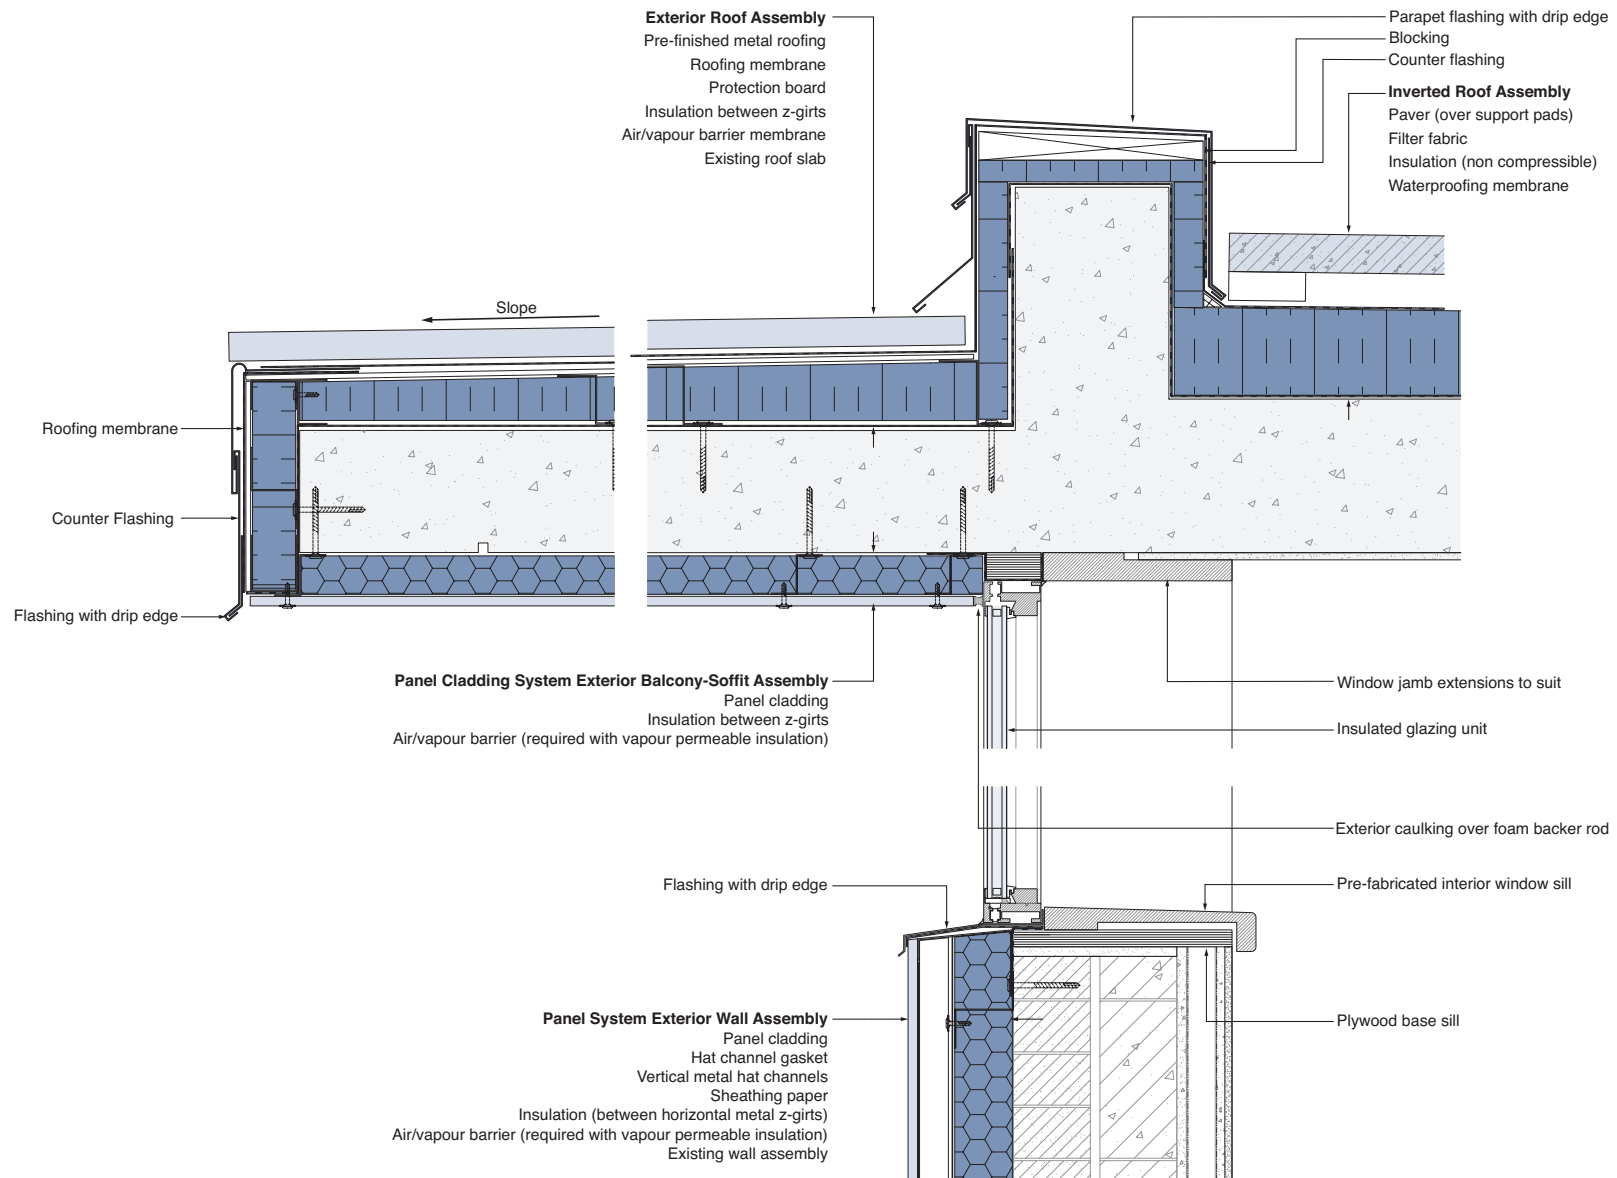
Two roofing systems are depicted in the above detail. An inverted roof system is shown for the main roof area, and a metal roofing system is shown for the cantilevered roof slab. EIFS is applied to the soffit and the balcony wall and window replacement are the same as detailed in the previous section.
